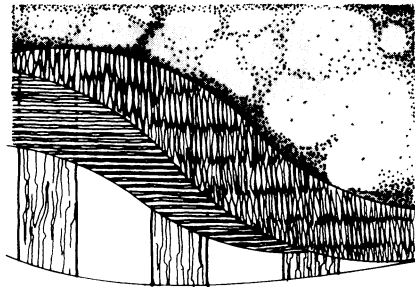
Ceiling detail showing tamarisk (athel) tree trunks and palm-tree branches
